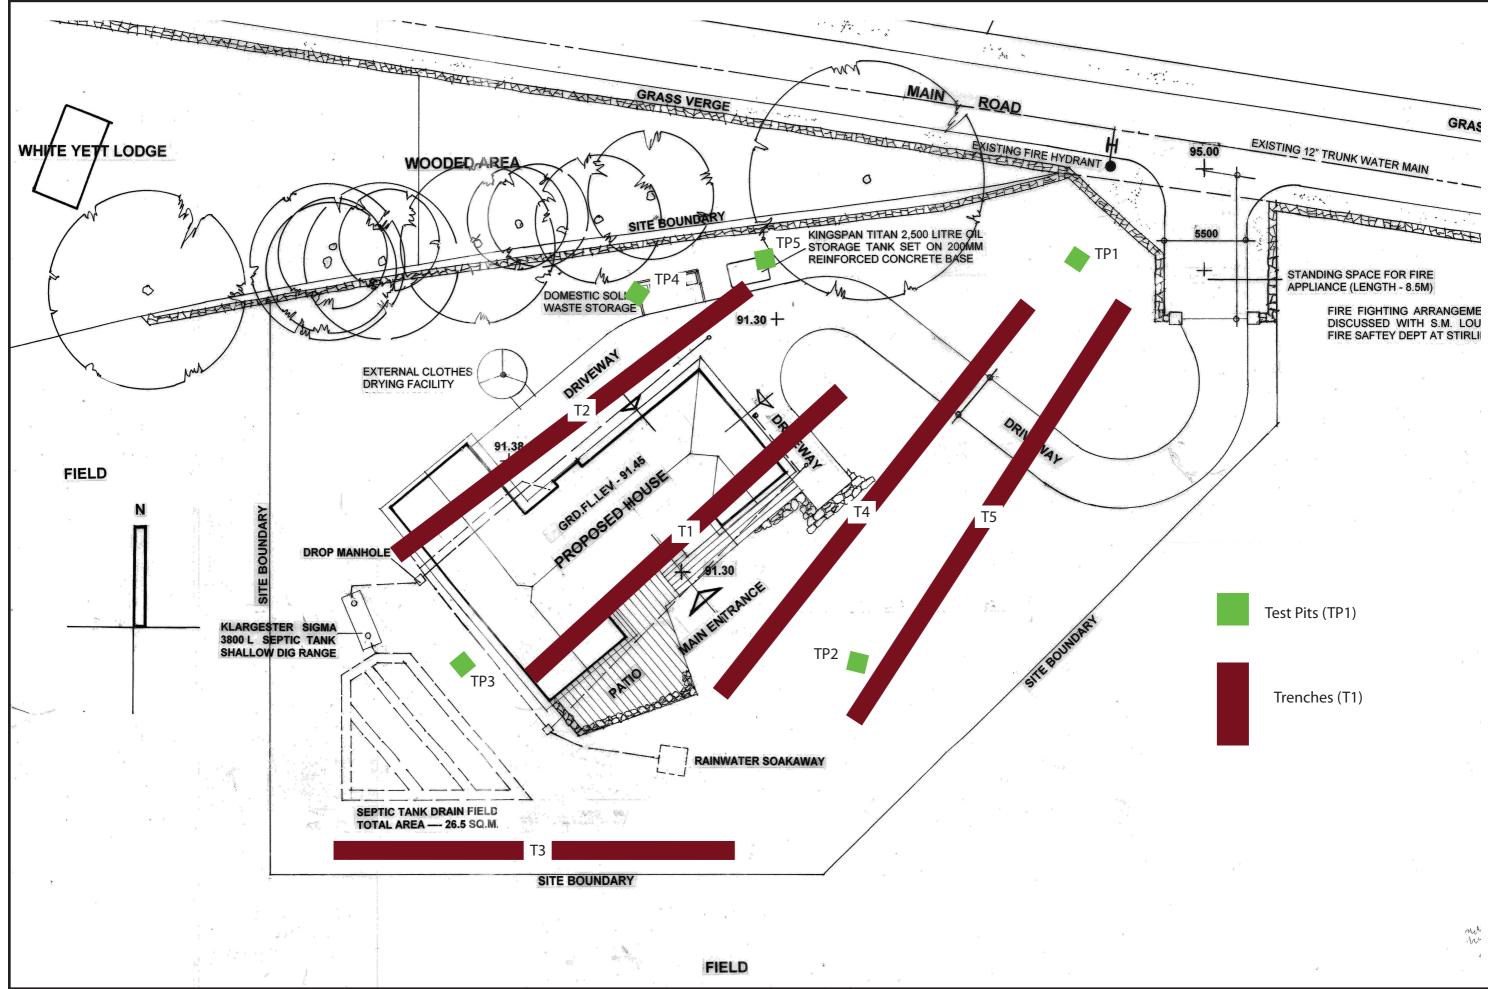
Site Plan (provided by James M Kerr Architects), showing Test Pit and Trench Locations
